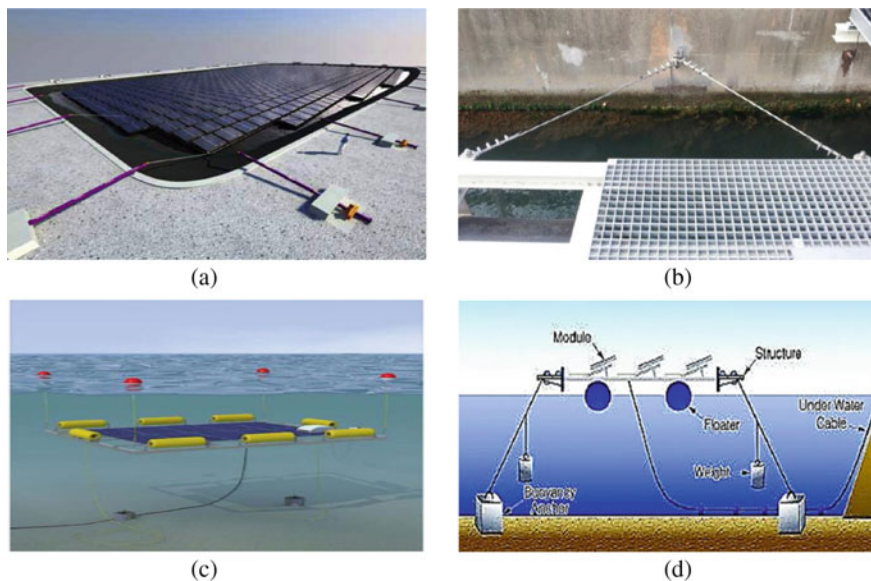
a Anchoring at the reservoir bank, b anchoring at reservoir embankment, c mooring system for submerged PV, d pile anchoring system [9, 20, 23, 26]
